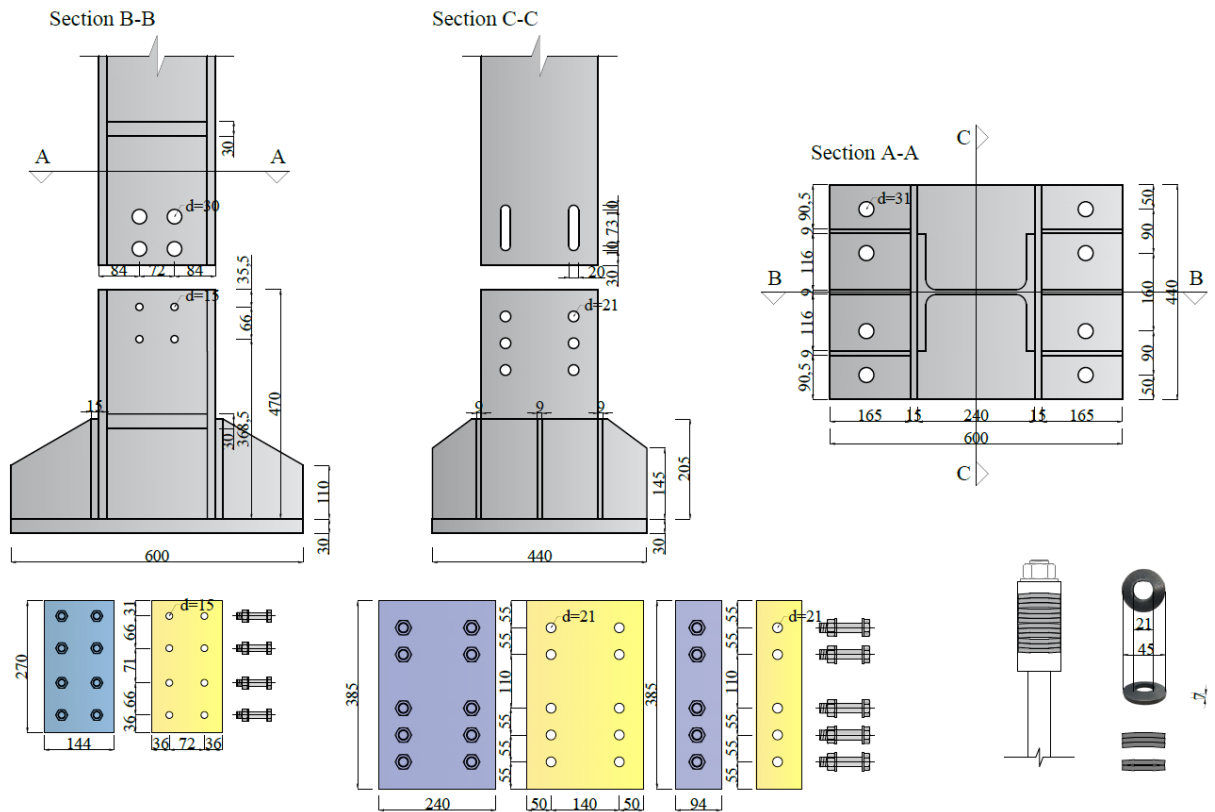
Geometry of the tested specimen SC-CB (dimensions in mm) [1].
